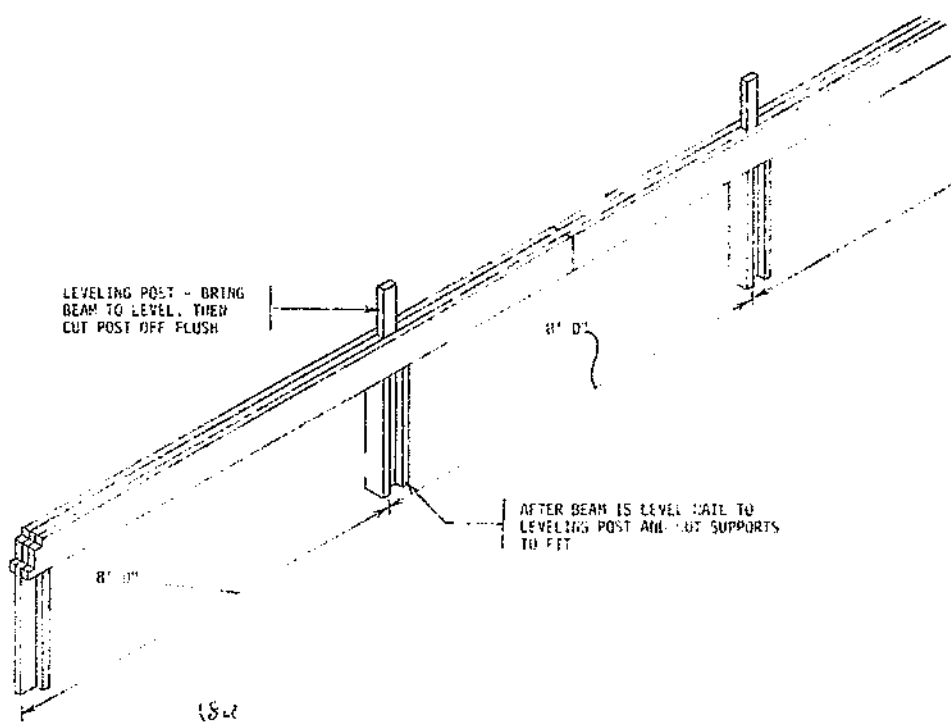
Center beam designed for compatibility with panelized foundation.
